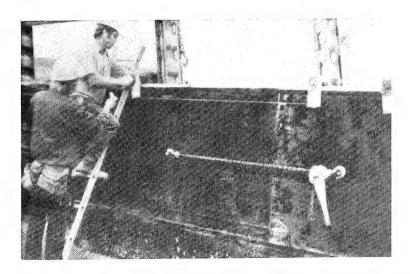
PVC-lined precast panels, Winchester Dam (from Moler and Moore 1988)
